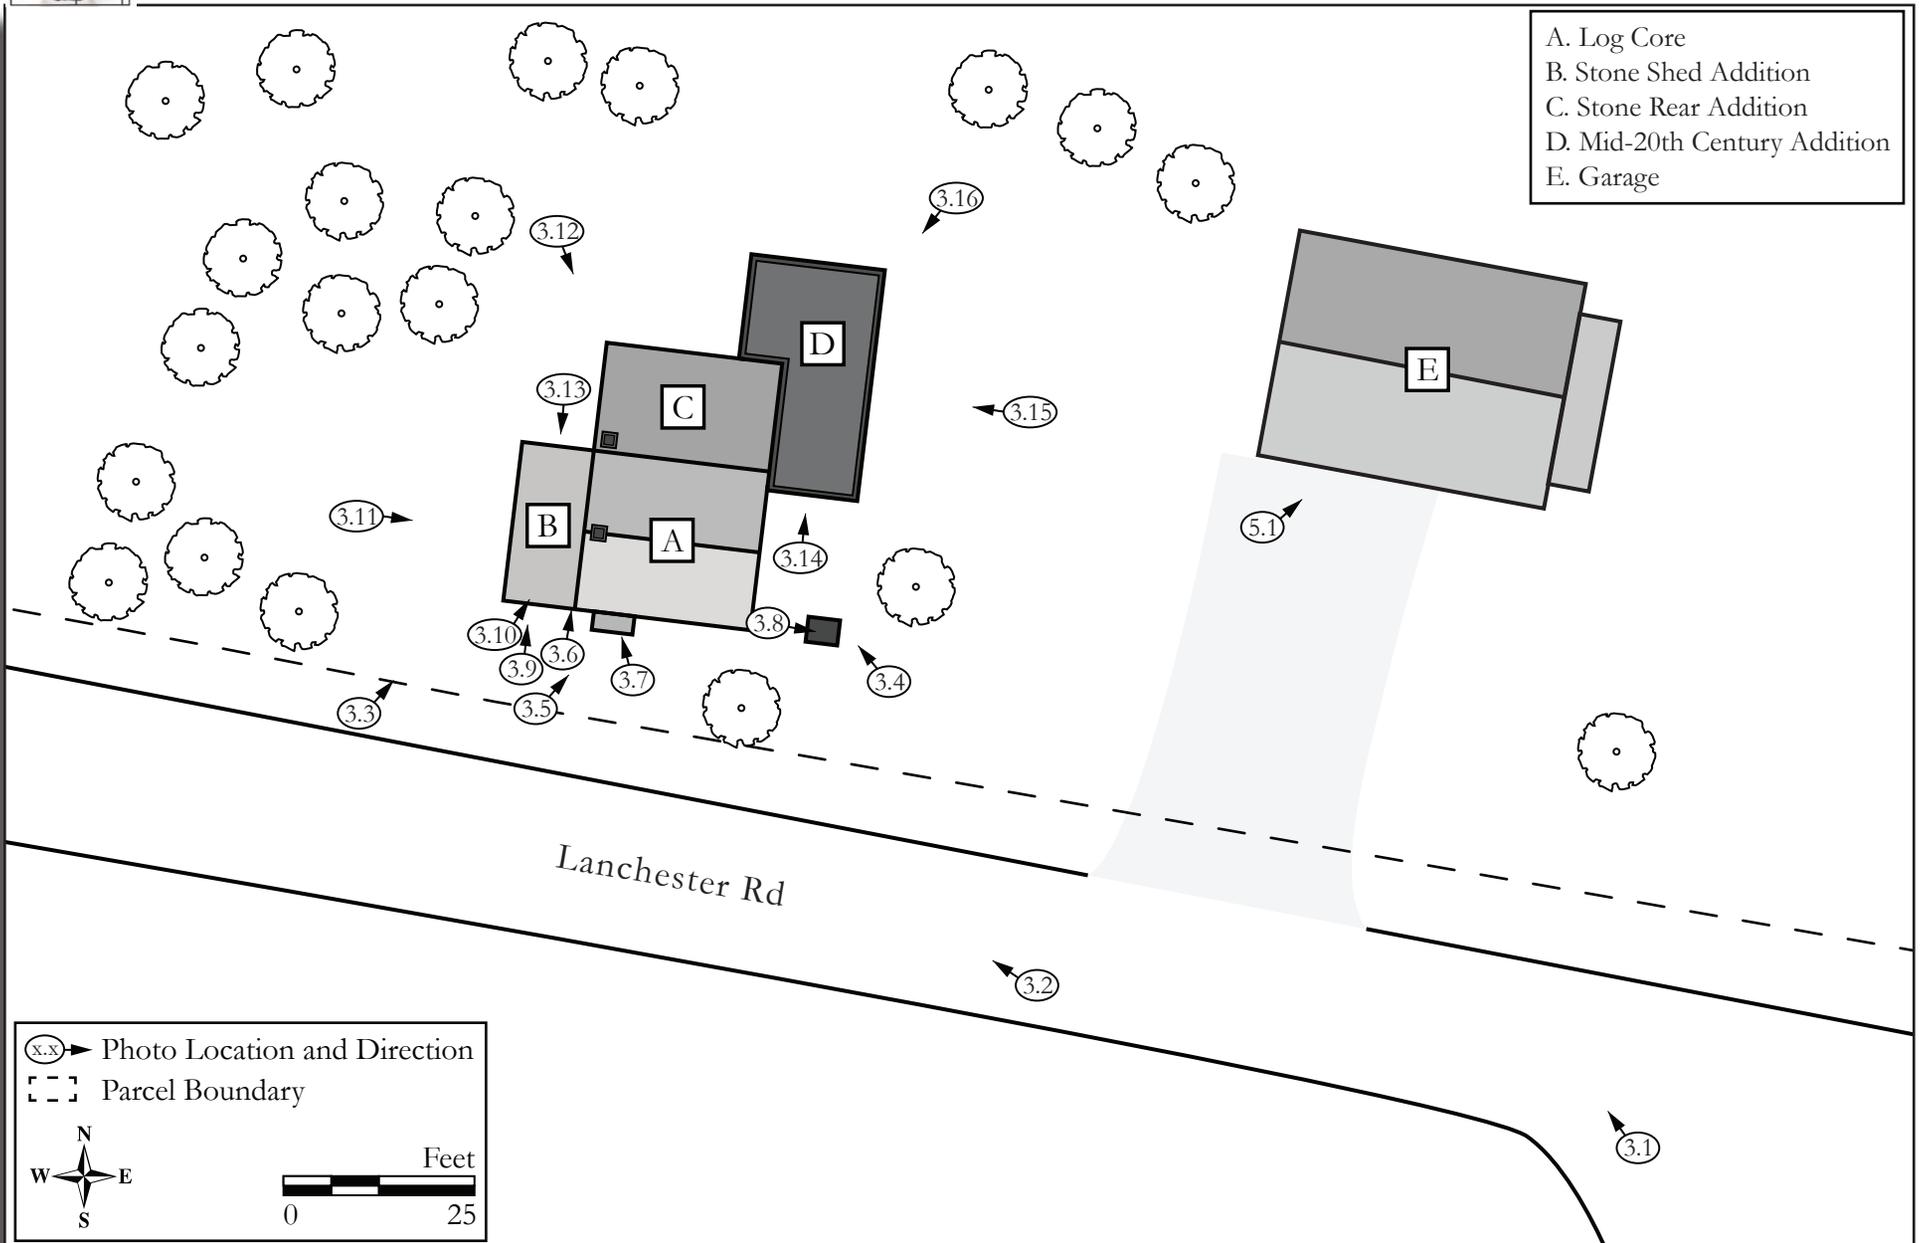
Site Plan showing exterior photograph locations and directions.
